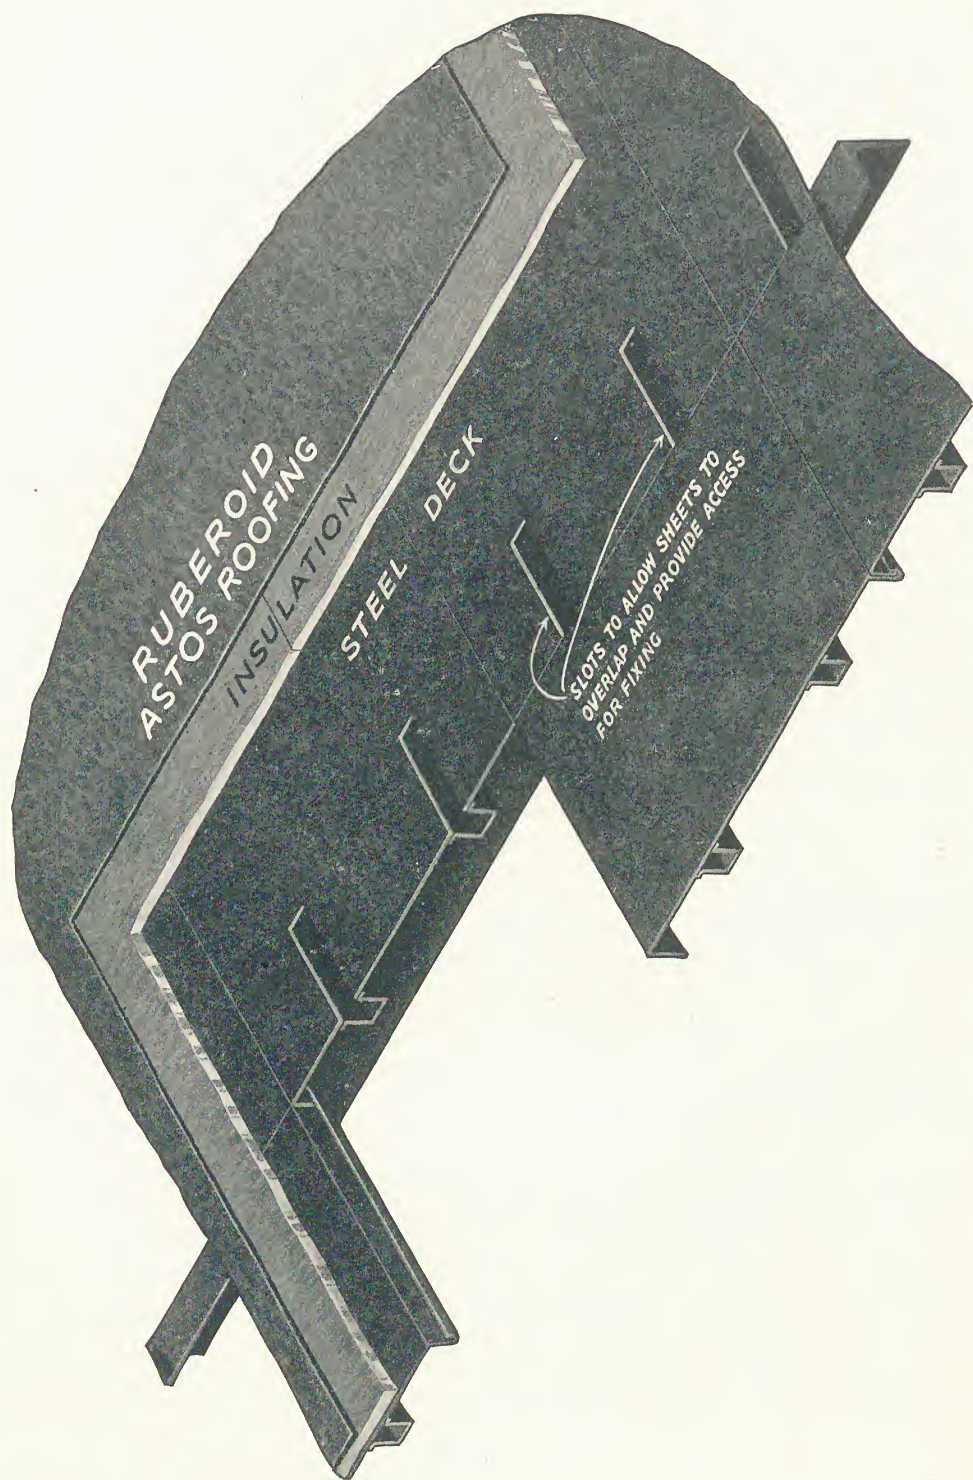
Details of 2-channel Ruberoid Steel Deck secured to steel angles with hook bolts, showing insulation and roof covering.
